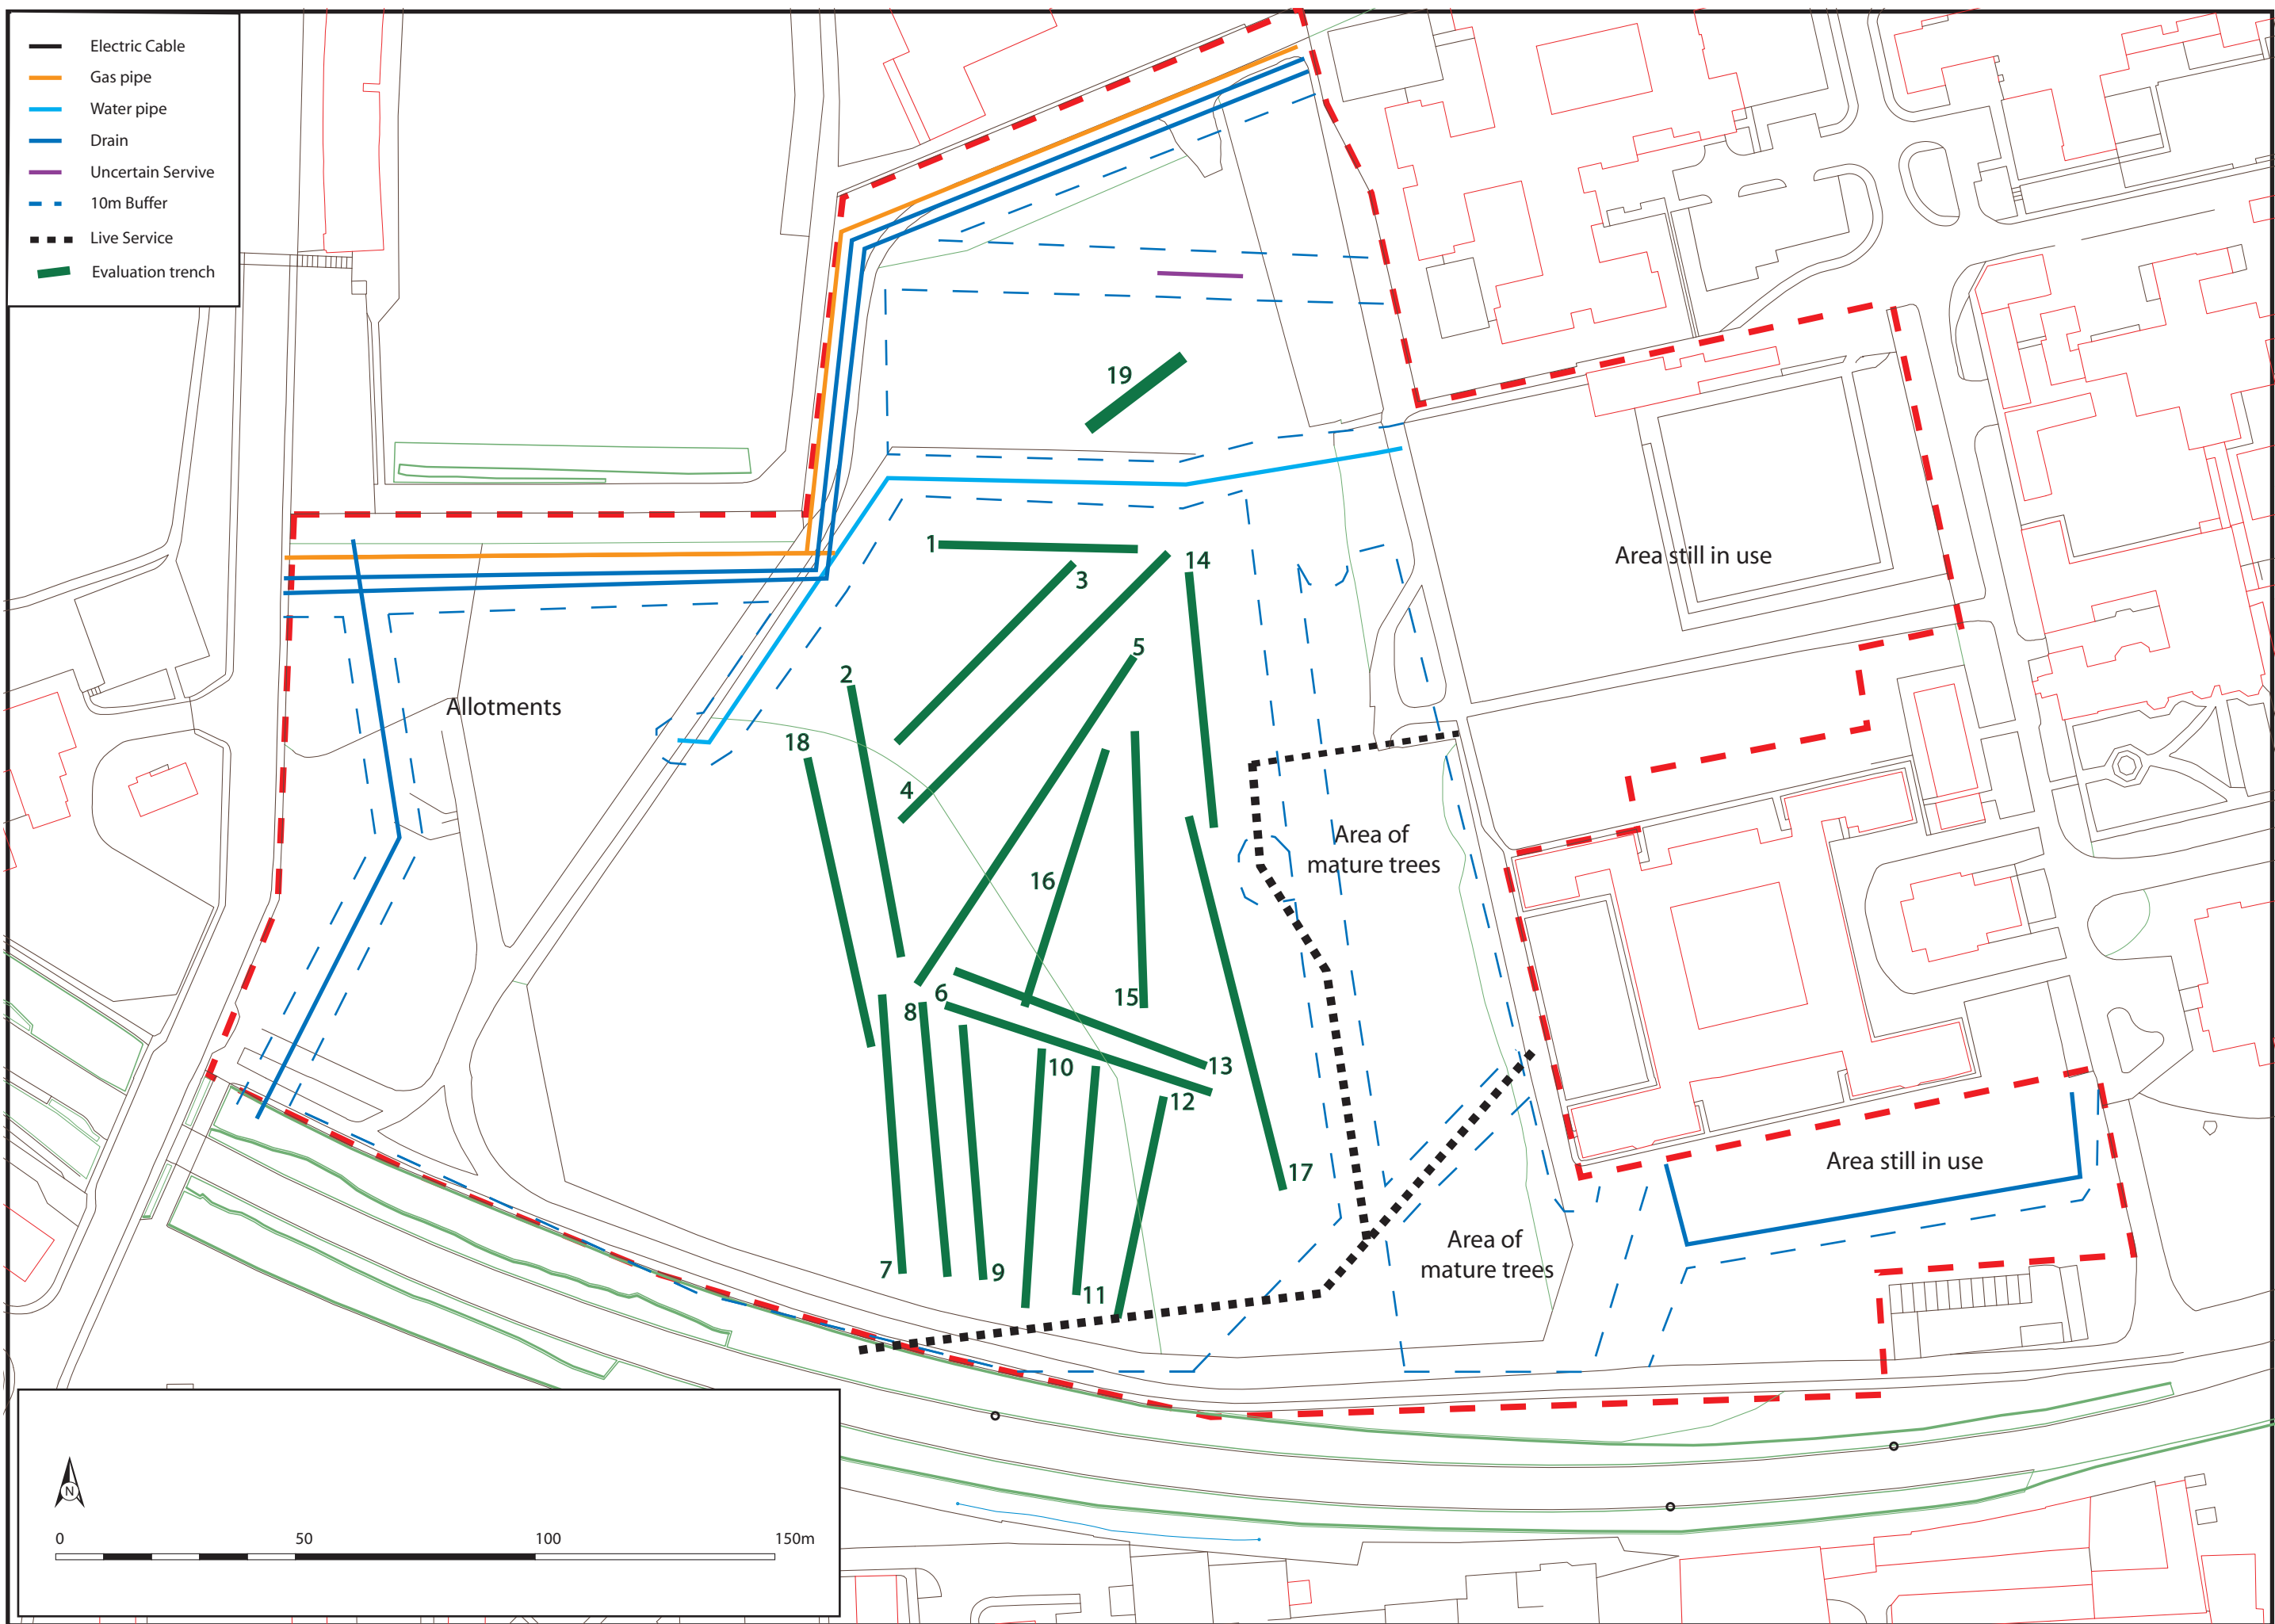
Site plan of Phase 1 development area showing position of evaluation trenches
